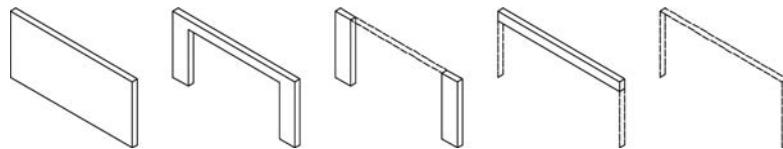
Execution varieties of breakthroughs in load-bearing facade elements: a) existing, b) easiest option, removing parapet, c) removing parapet and “beam”, d) removing “columns”, e) removing complete element.
